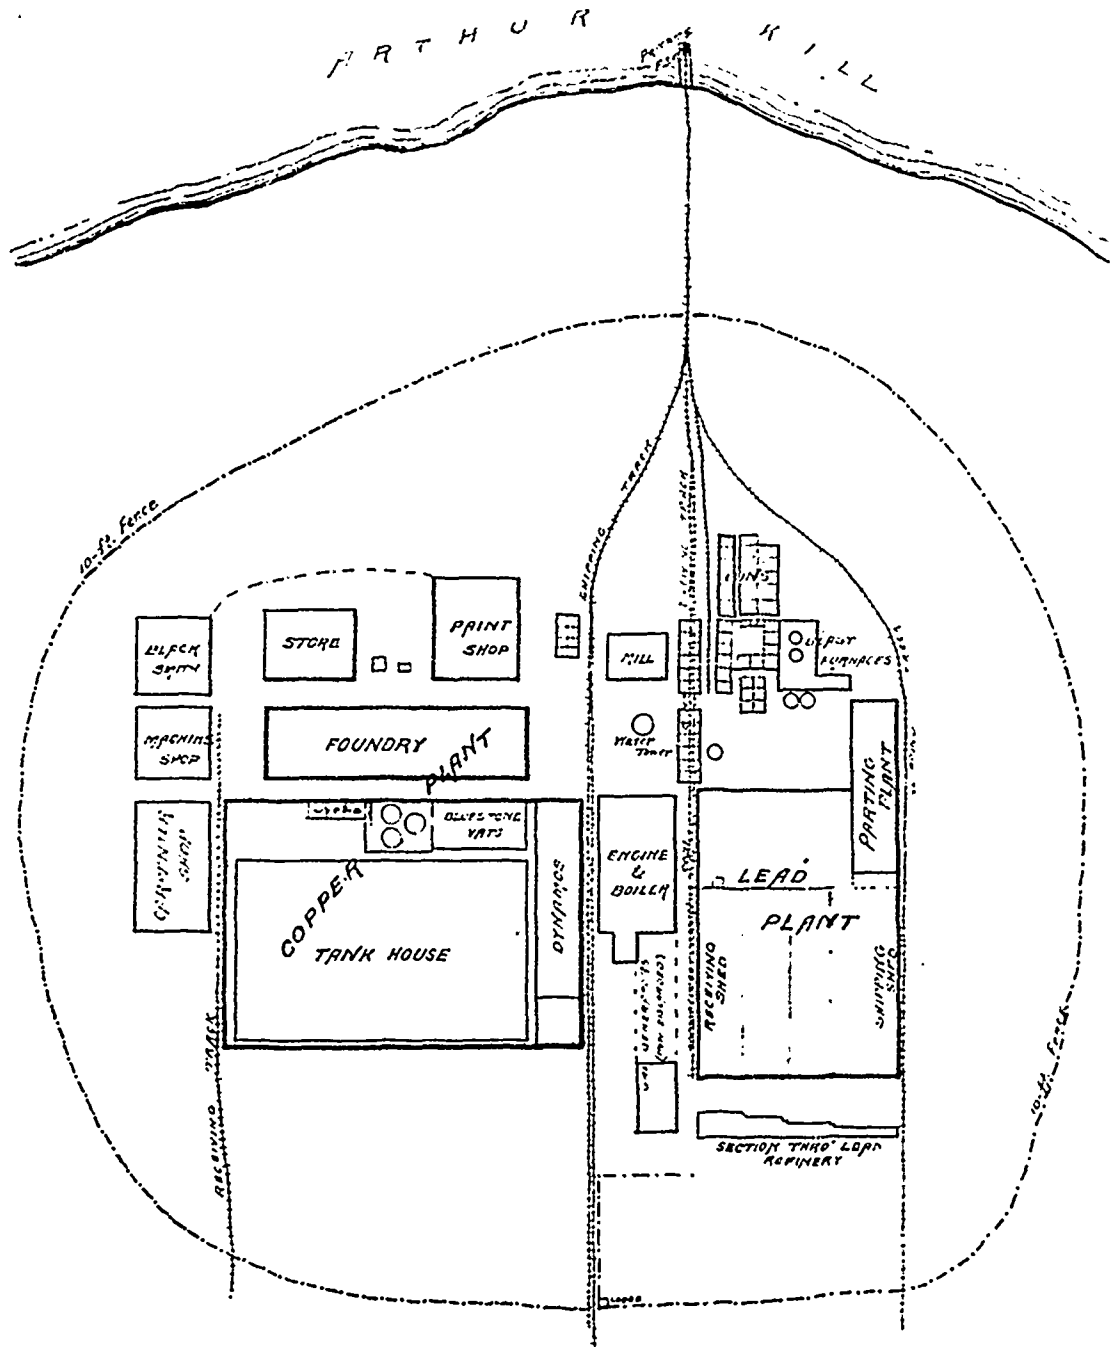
PLATE I. GENERAL PLAN OF GUGGENHEIM SMELTING WORKS
